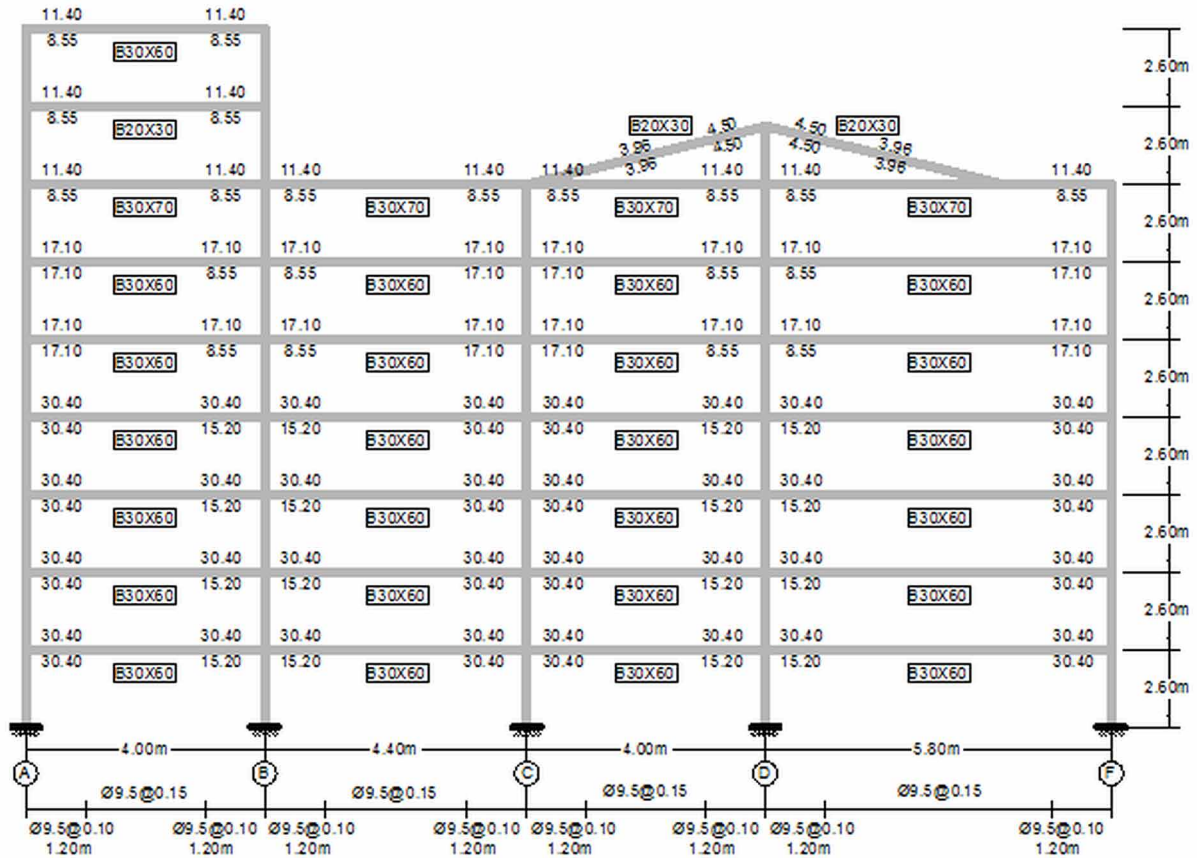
Residential building, geometry and reinforcement in columns of the frame 6
